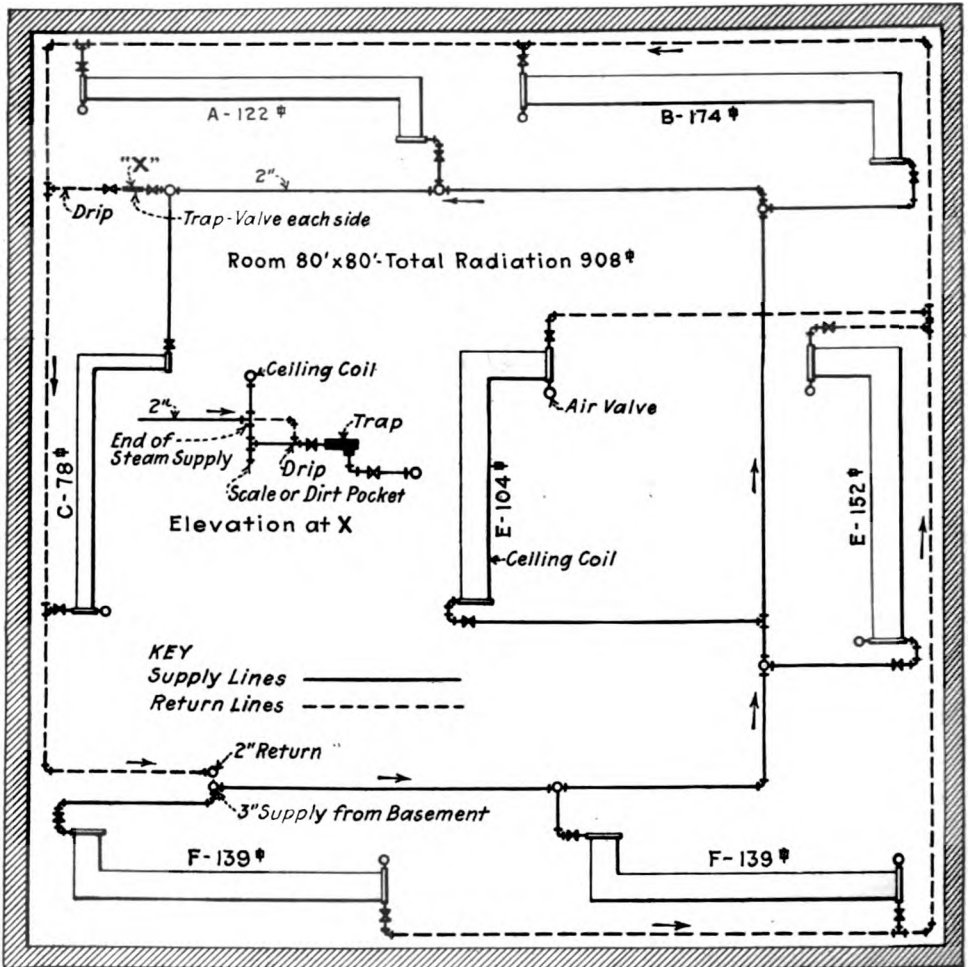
FIRST FLOOR PLAN—CORRECT METHOD OF PIPING TO CEILING COILS.
